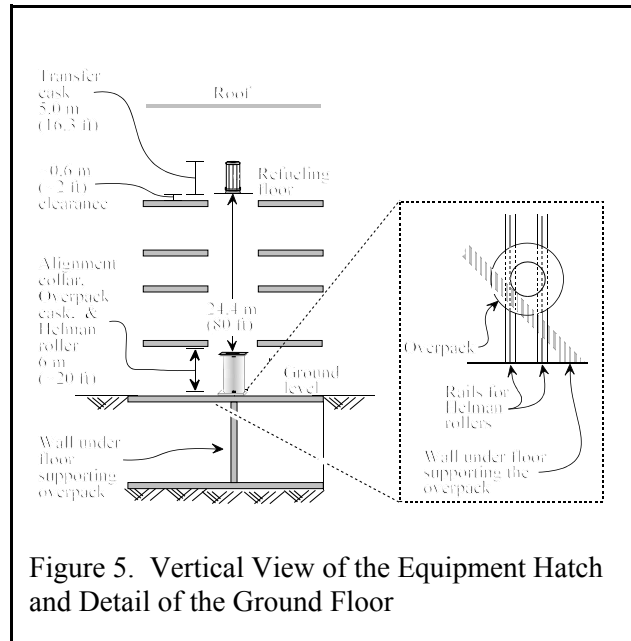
Vertical View of the Equipment Hatch and Detail of the Ground Floor
